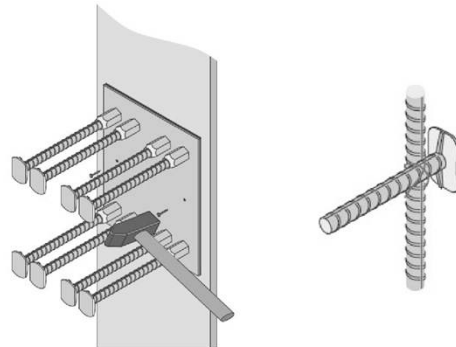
Fix the mounting template to the formwork, wire-tied the HSC-B socket bars to the element reinforcement
